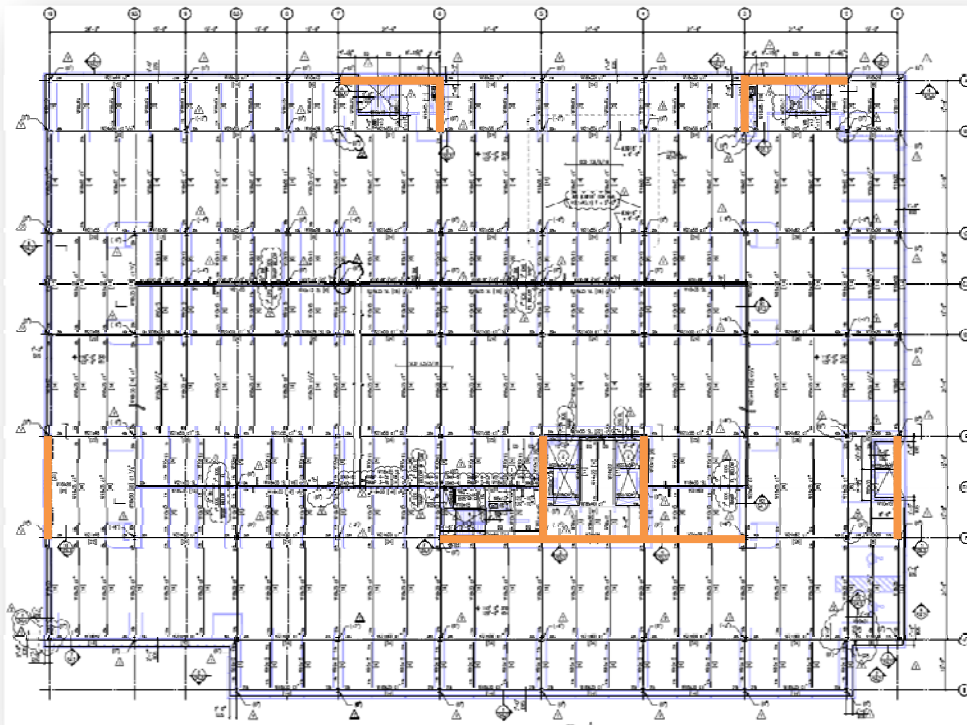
Typical Floor Framing Layout and Lateral Bracing Layout
